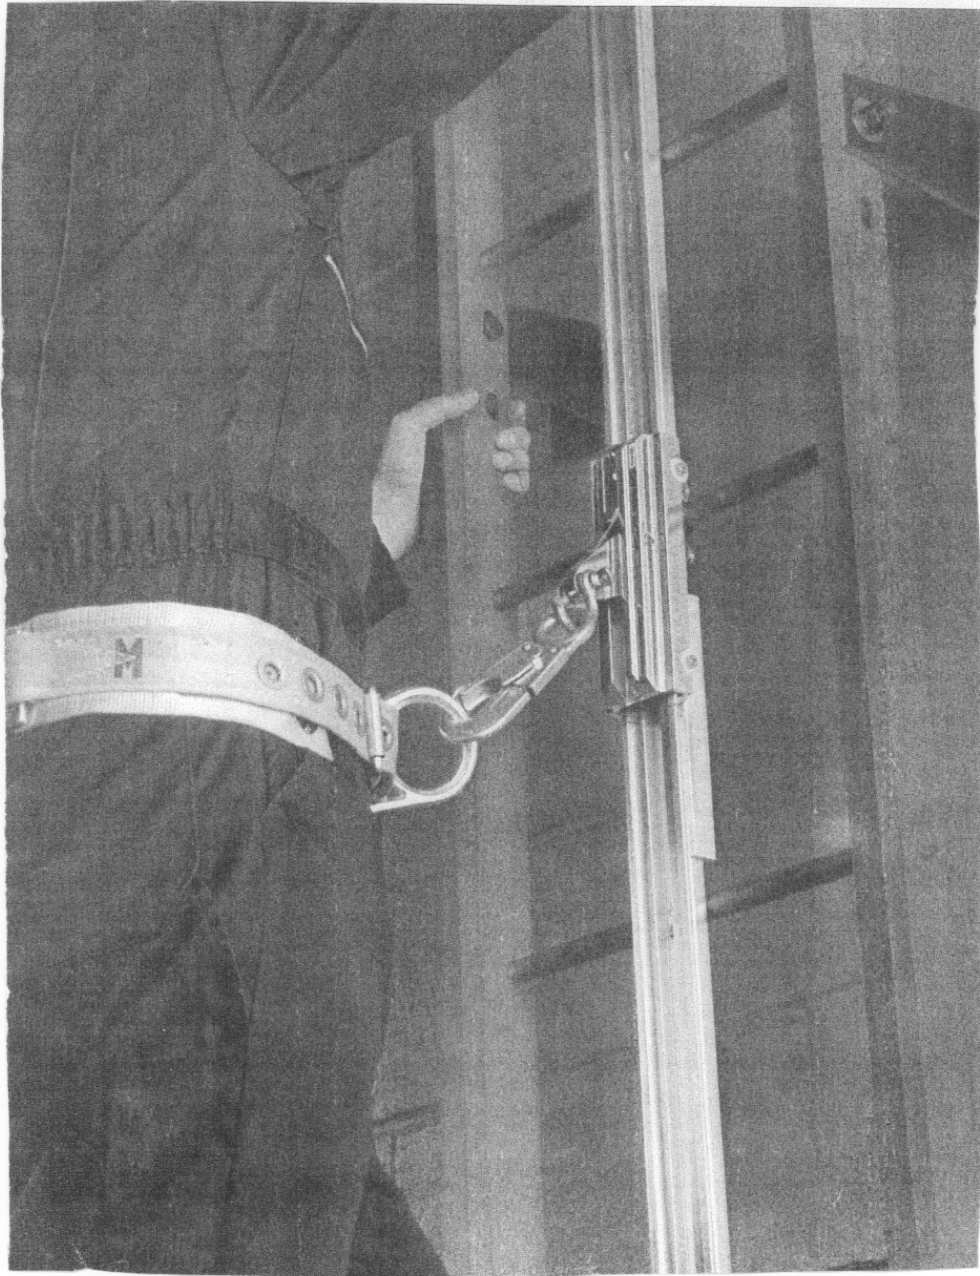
Typical Arrangement for Worker Attachment to Ladder's T-Rail
